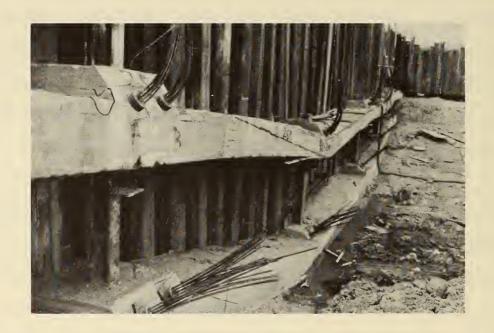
CONCRETE WALES CAST ON THE GROUND, directly on the excavation bottom. Friction-reducing cardboard is inserted between the concrete and the sheets. The procedure of driving sheets, excavating, tieing-back the soldier piles and casting the concrete waler is repeated until bedrock is reached.
